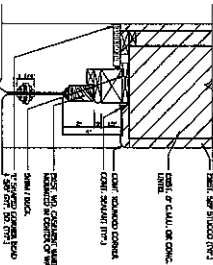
@ PROPOSED PICTURE WINDOW HEADRR
